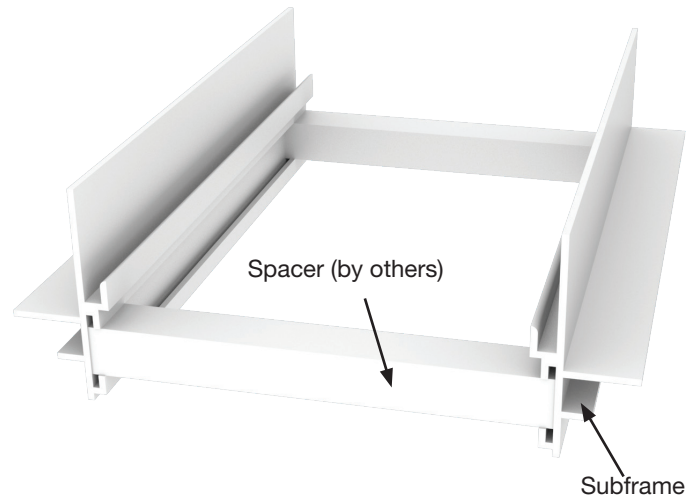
(Step 3B and 4A): Subframe Installed in Framing – Shown with Plenum/Duct (not required)
